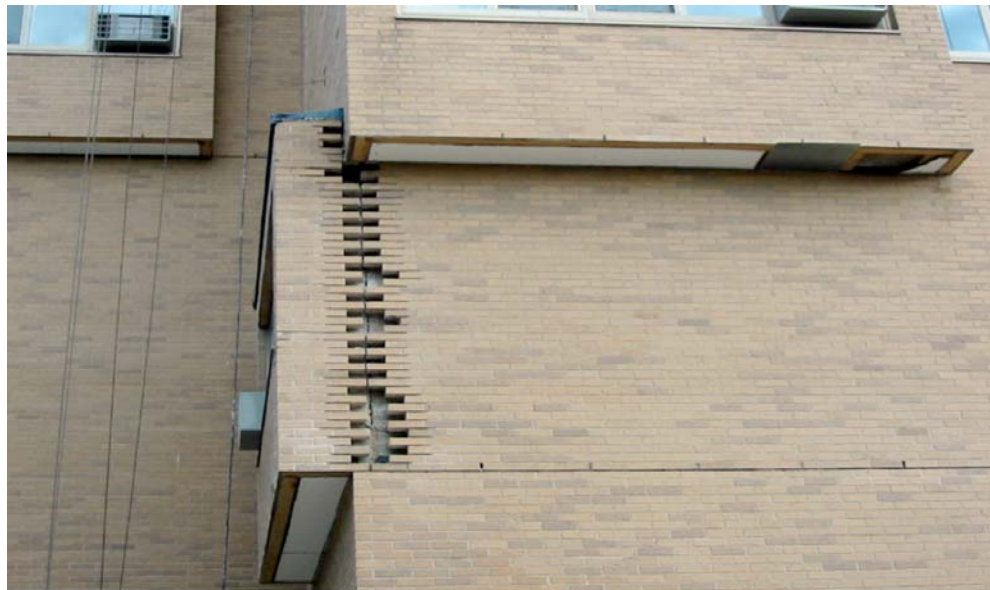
Tothing brick at building corner where original joint construction was ineffective
